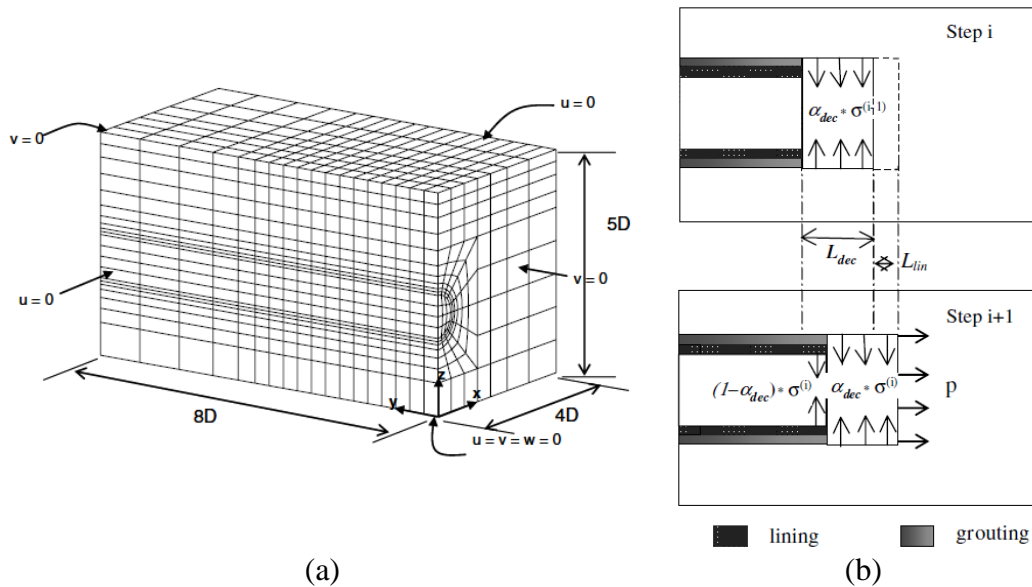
(a) Dimension and boundary condition of the tunnelling problem; (b) Method used for the tunnel construction using TBM (Mroueh & Shahrouh¹¹⁷, 2008).
